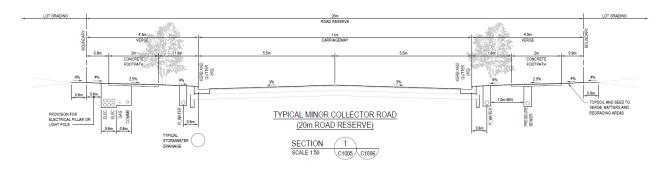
Section for Typical Minor Collector Road (Fairways North)
